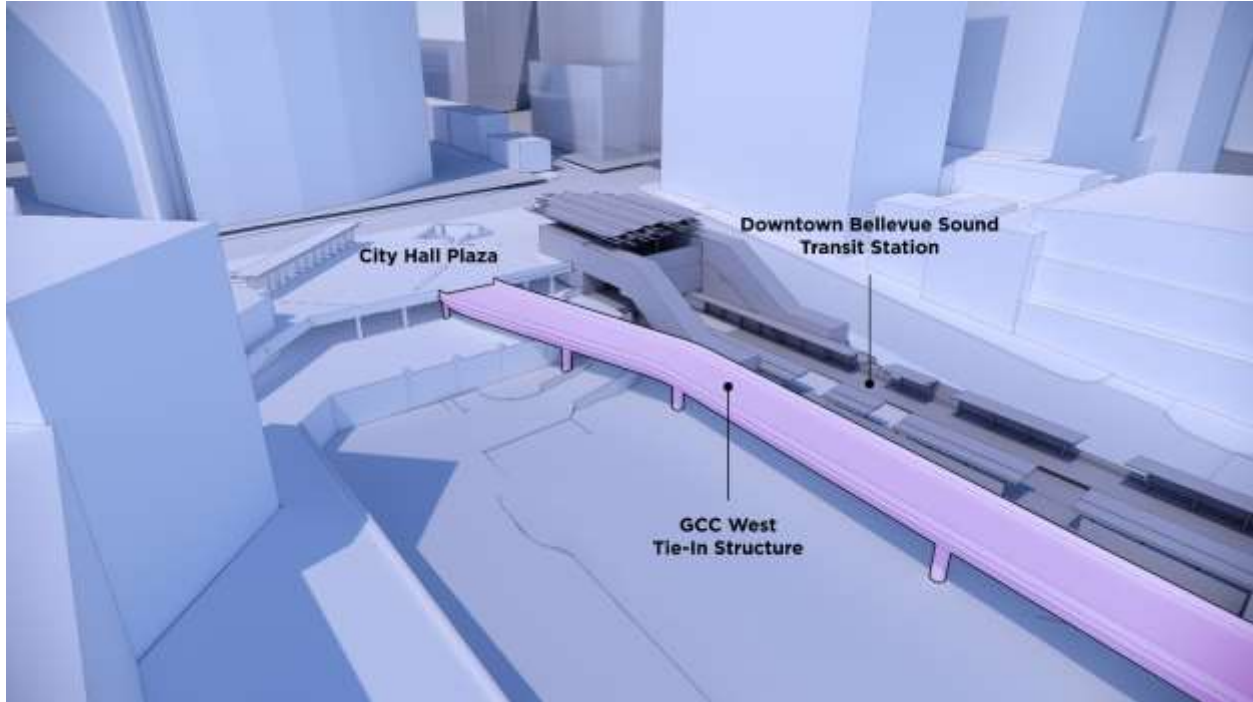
Conceptual rendering of west tie-in structure, CIP PT Box Girder.
